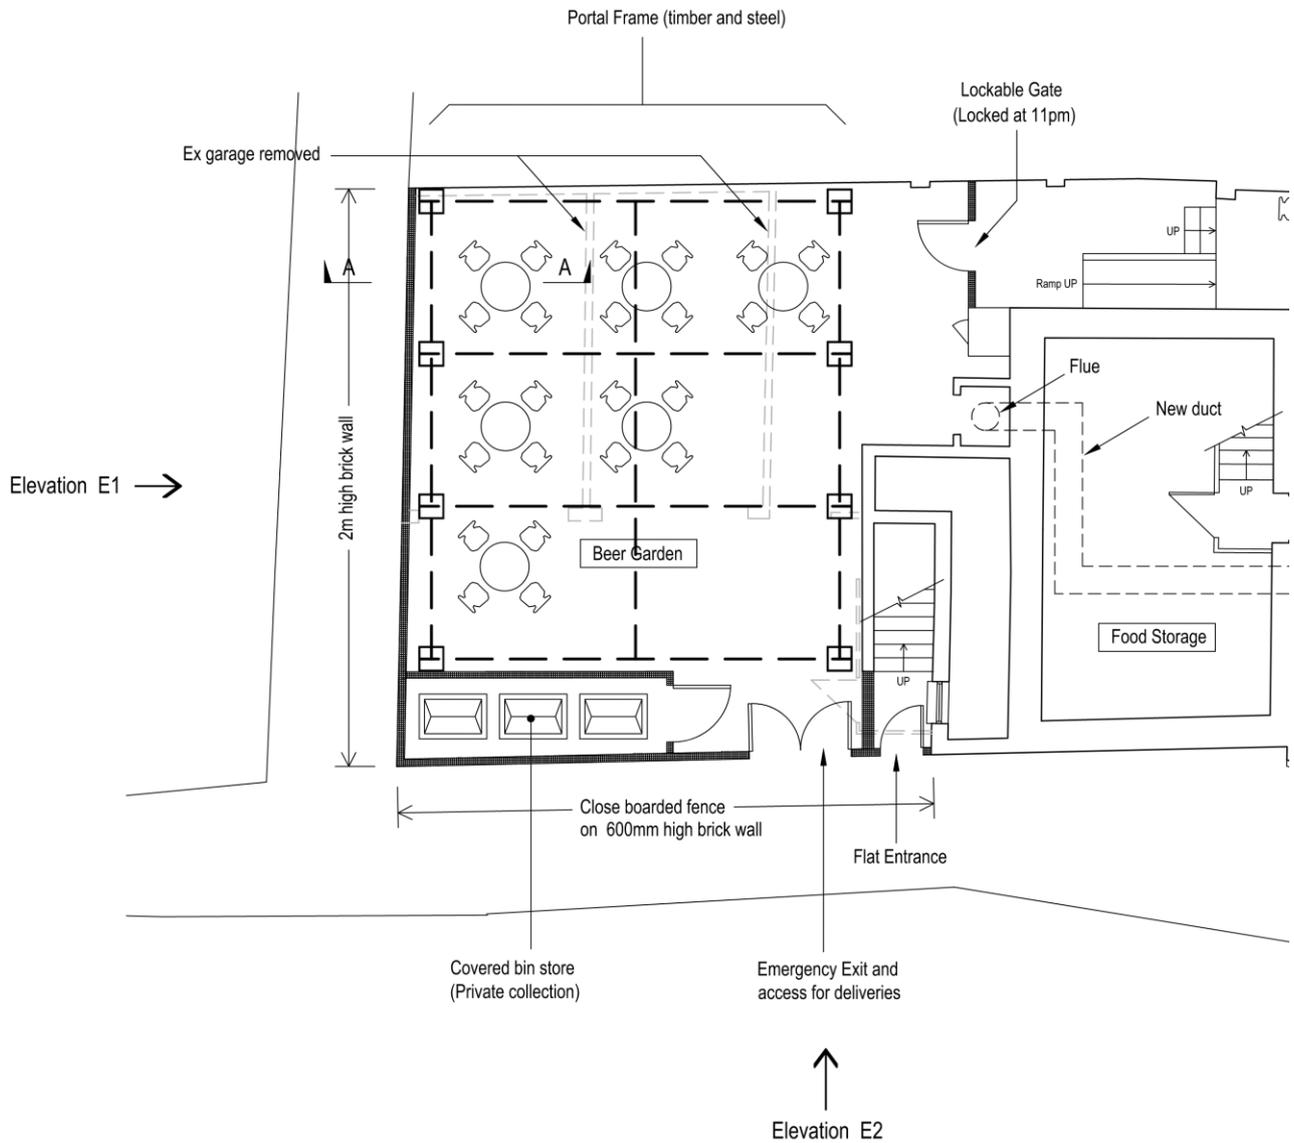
Architect's plan detail showing the proposed beer garden and structure to rear of main building
